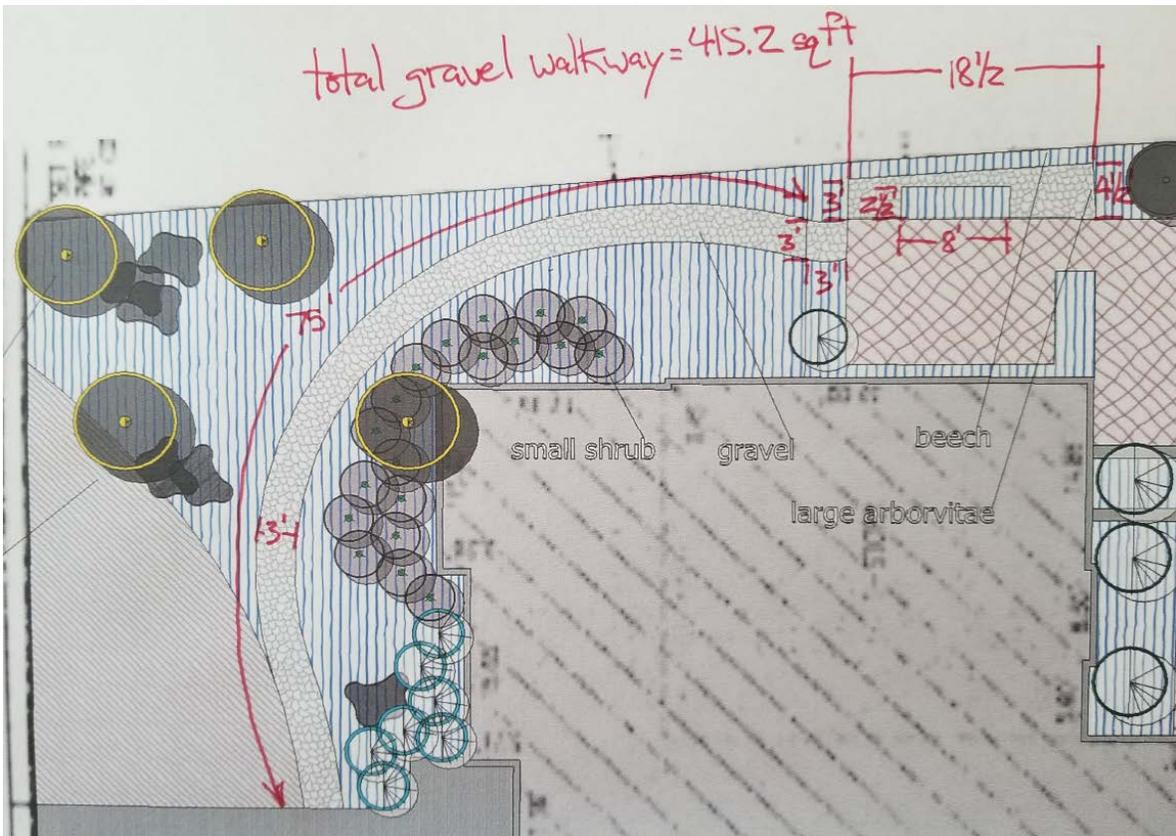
Excerpt of Proposed Site Plan – East Walk
